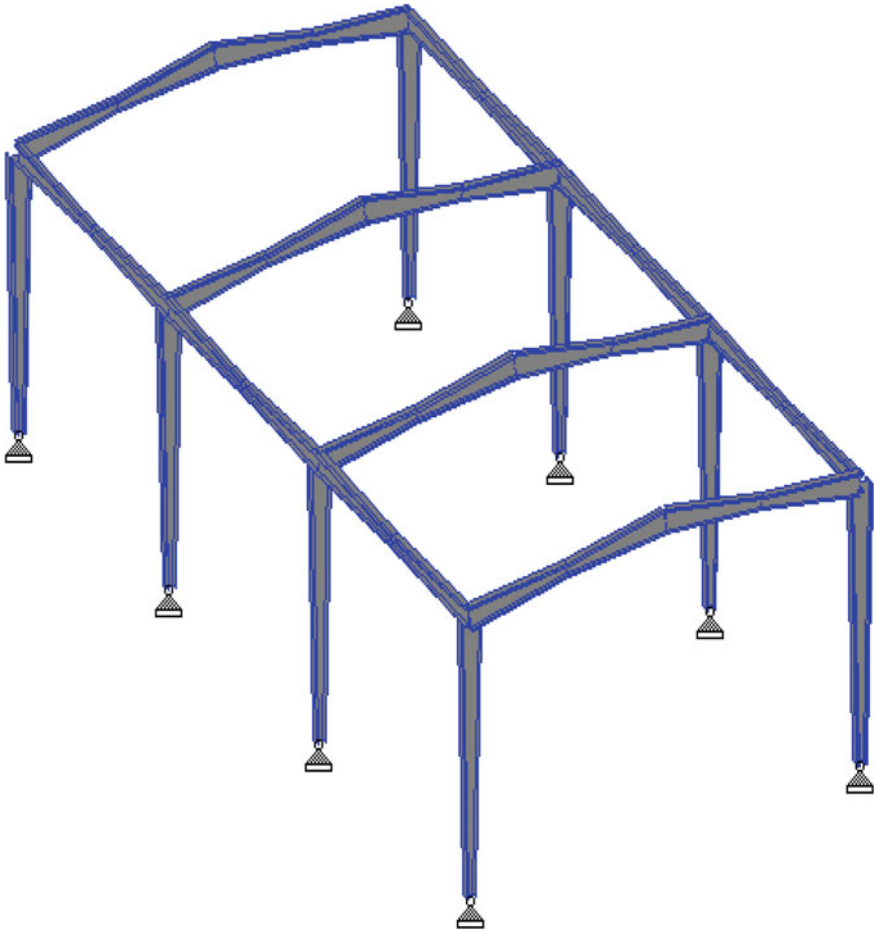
Typical 3-D frame consisting of built-up tapered I-sections
